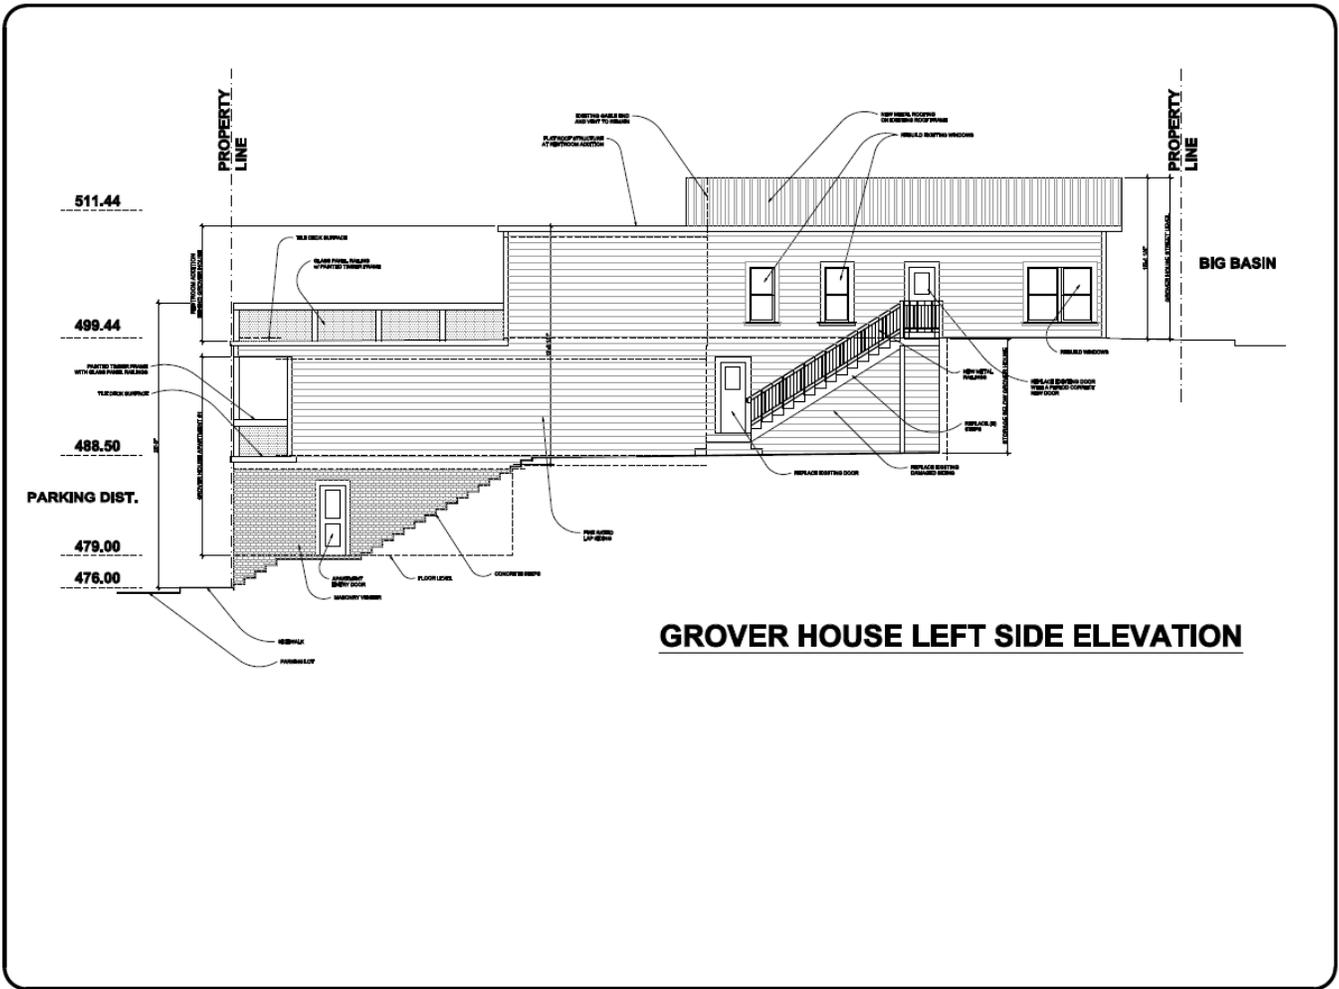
Elevations – Left Side – 14521 Big Basin Way (Grover House
